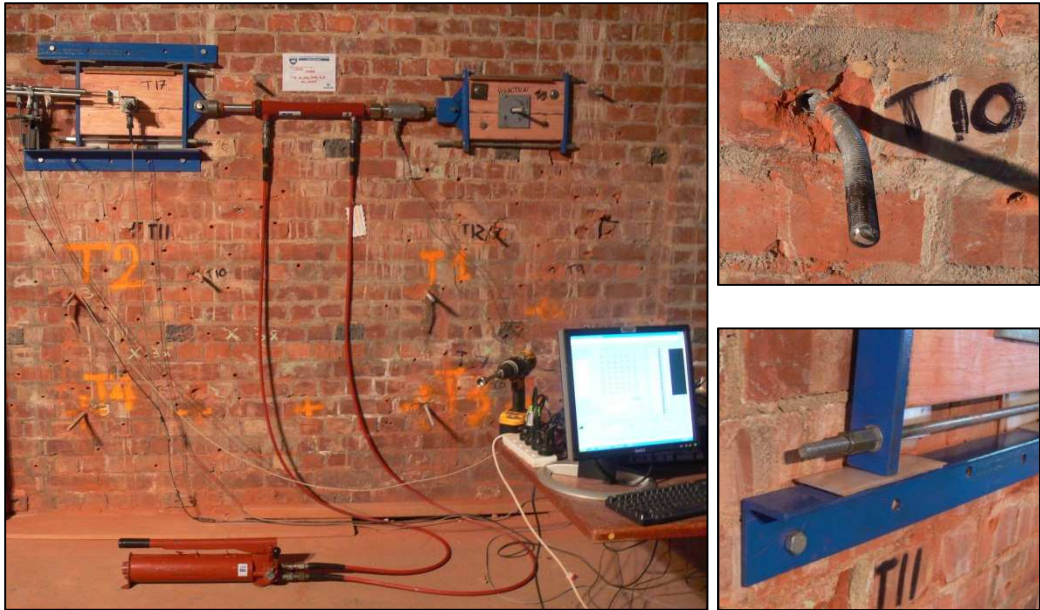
Shear tests of the anchors: a) test setup; b) observed failure mode; c) low-friction sheets.
